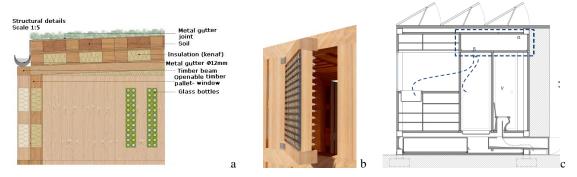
Structural details (a) of roof and walls, made of wooden pallets, openings made of glass bottles and water piping by the students V. Antonopoulos, A. Ioannou and V. Charalampopoulou (b) of a window, made of glass bottles and timber frame, which is nailed to the timber wall by the students F. Dimoglou, I. Theodosopoulou and S. Pavlidou and (c) rain water harvesting for sanitary water, compost toilet for water saving, photovoltaics for electricity production and solar panels for Sanitary Hot Water production in the project by the students G. Kourakos and Th. Svoronos.
